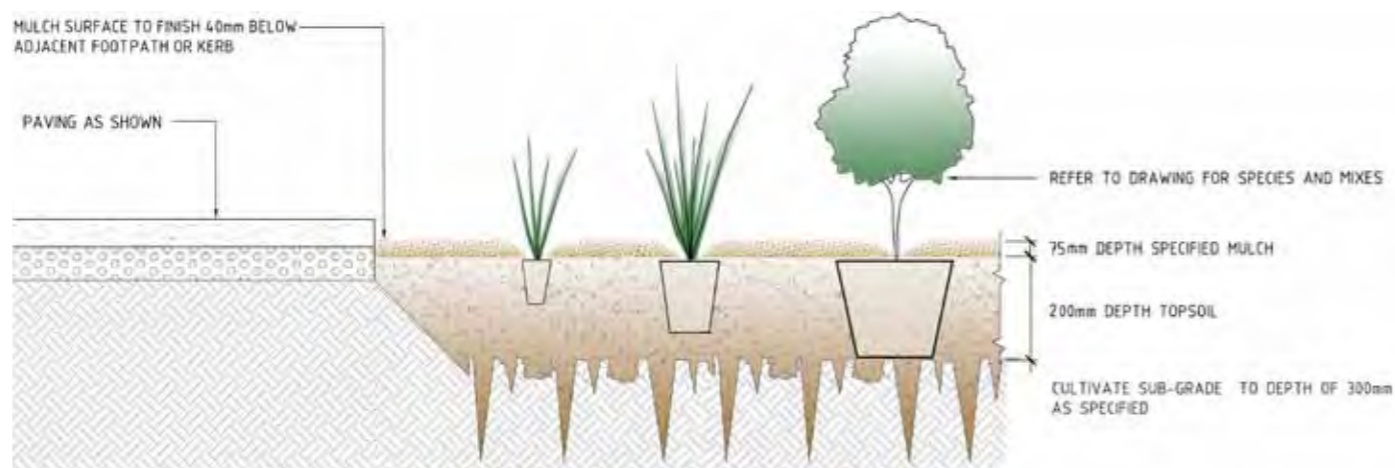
Accent planting areas adjacent paving or kerb - various pot sizes
